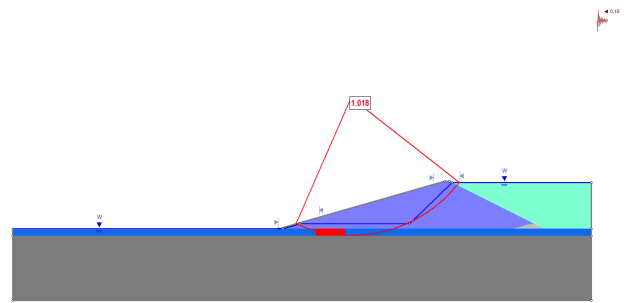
Slope stability analysis, JGC shear panels improvement, seismic loading, and undrained behavior.
